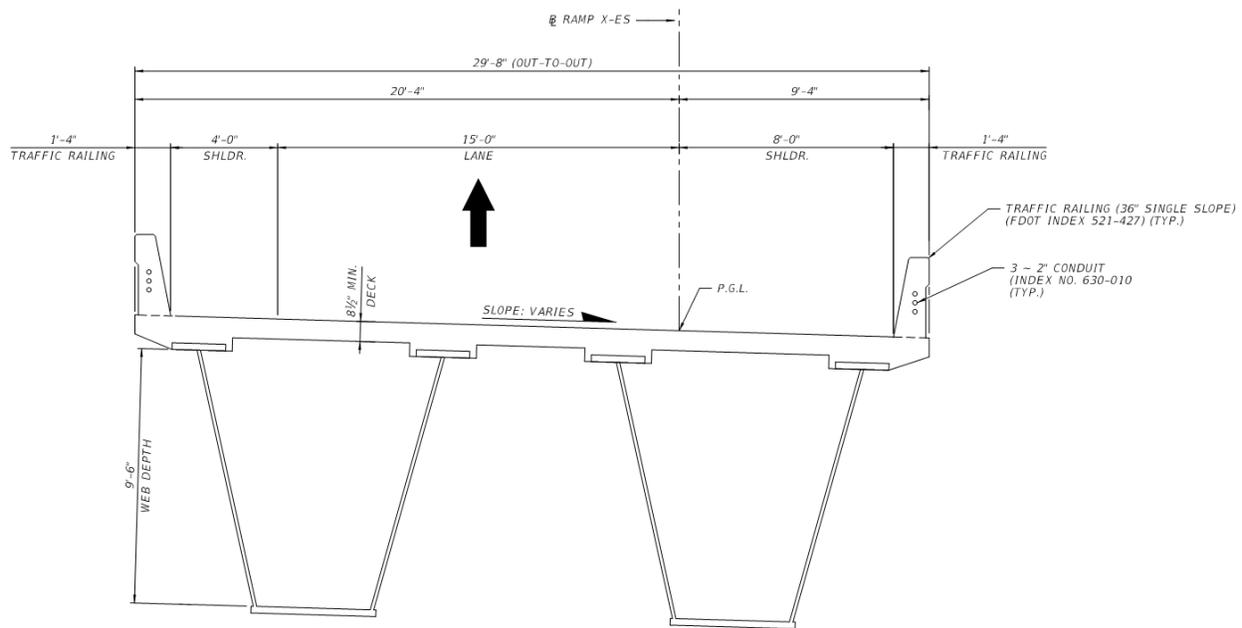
Bridge Typical Section (Bridge No. 4)
